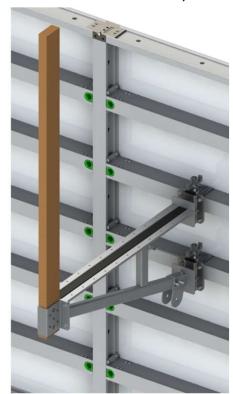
Walkway Bracket With 2x4 Wood Guardrail Post Assembly
